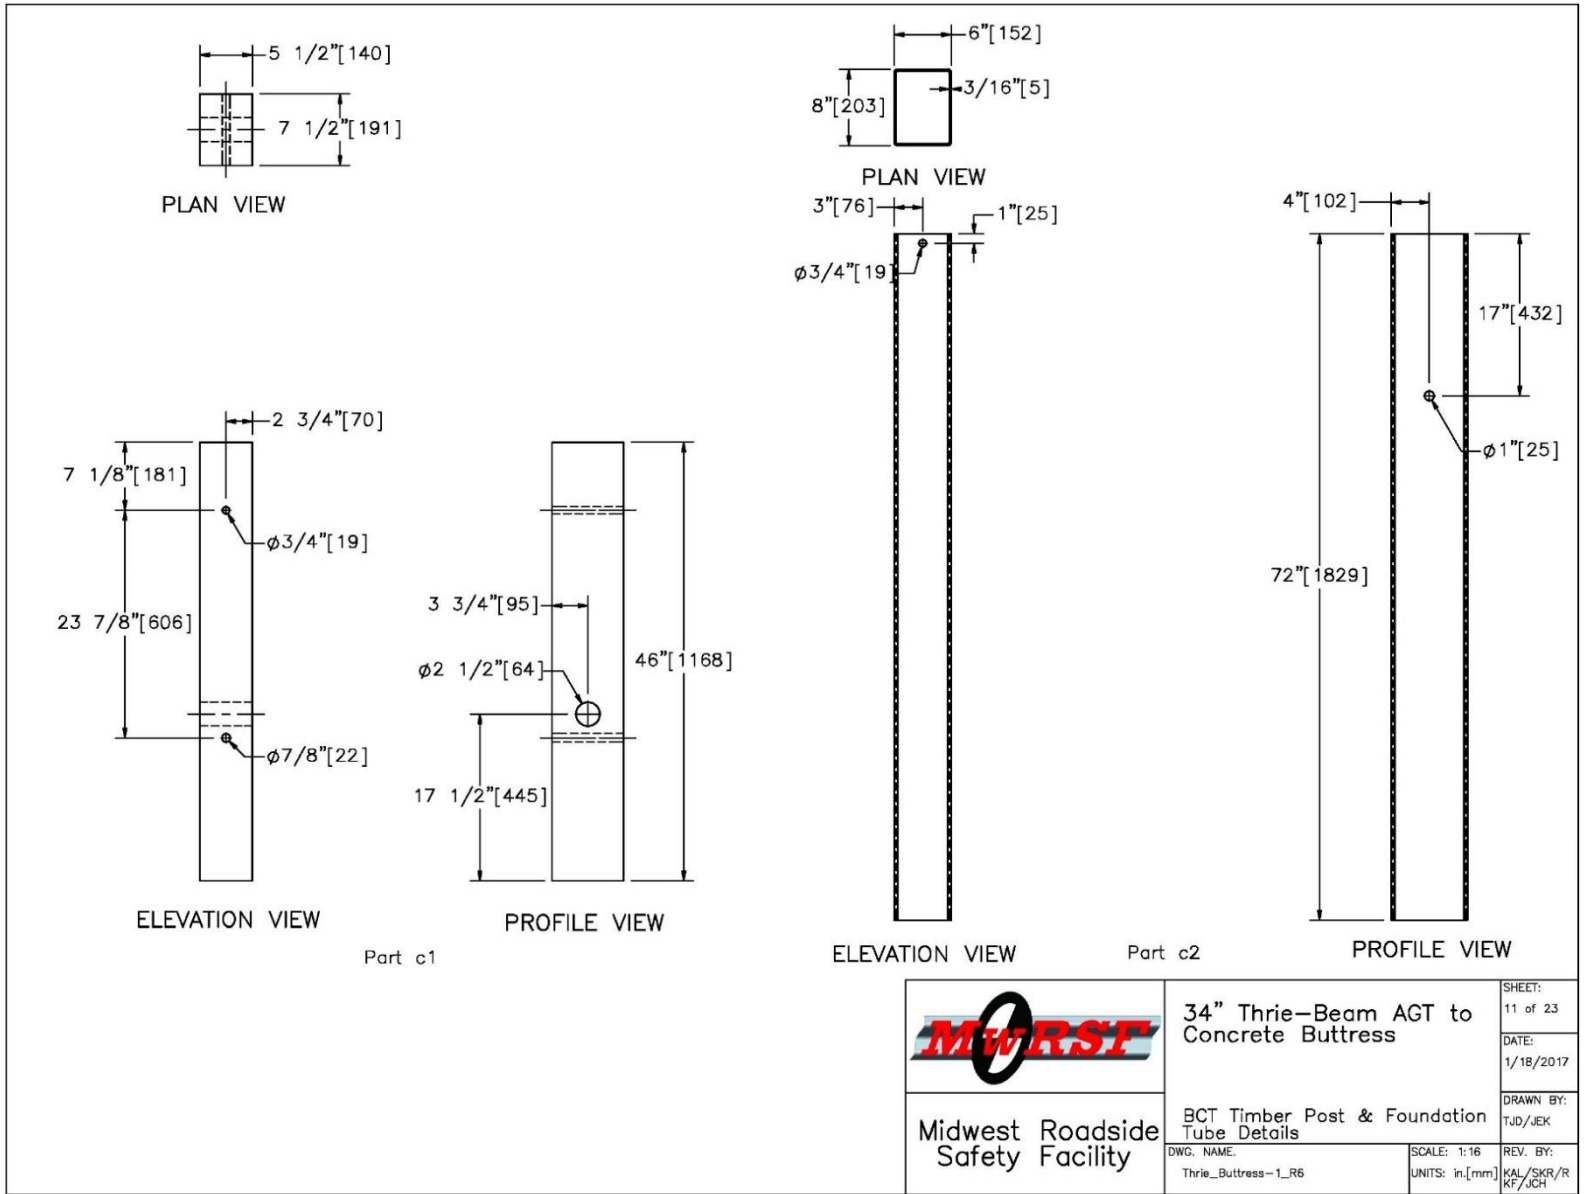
BCT Timber Post & Foundation Tube Details, Test Nos. 34AGT-1 and 34AGT-2
